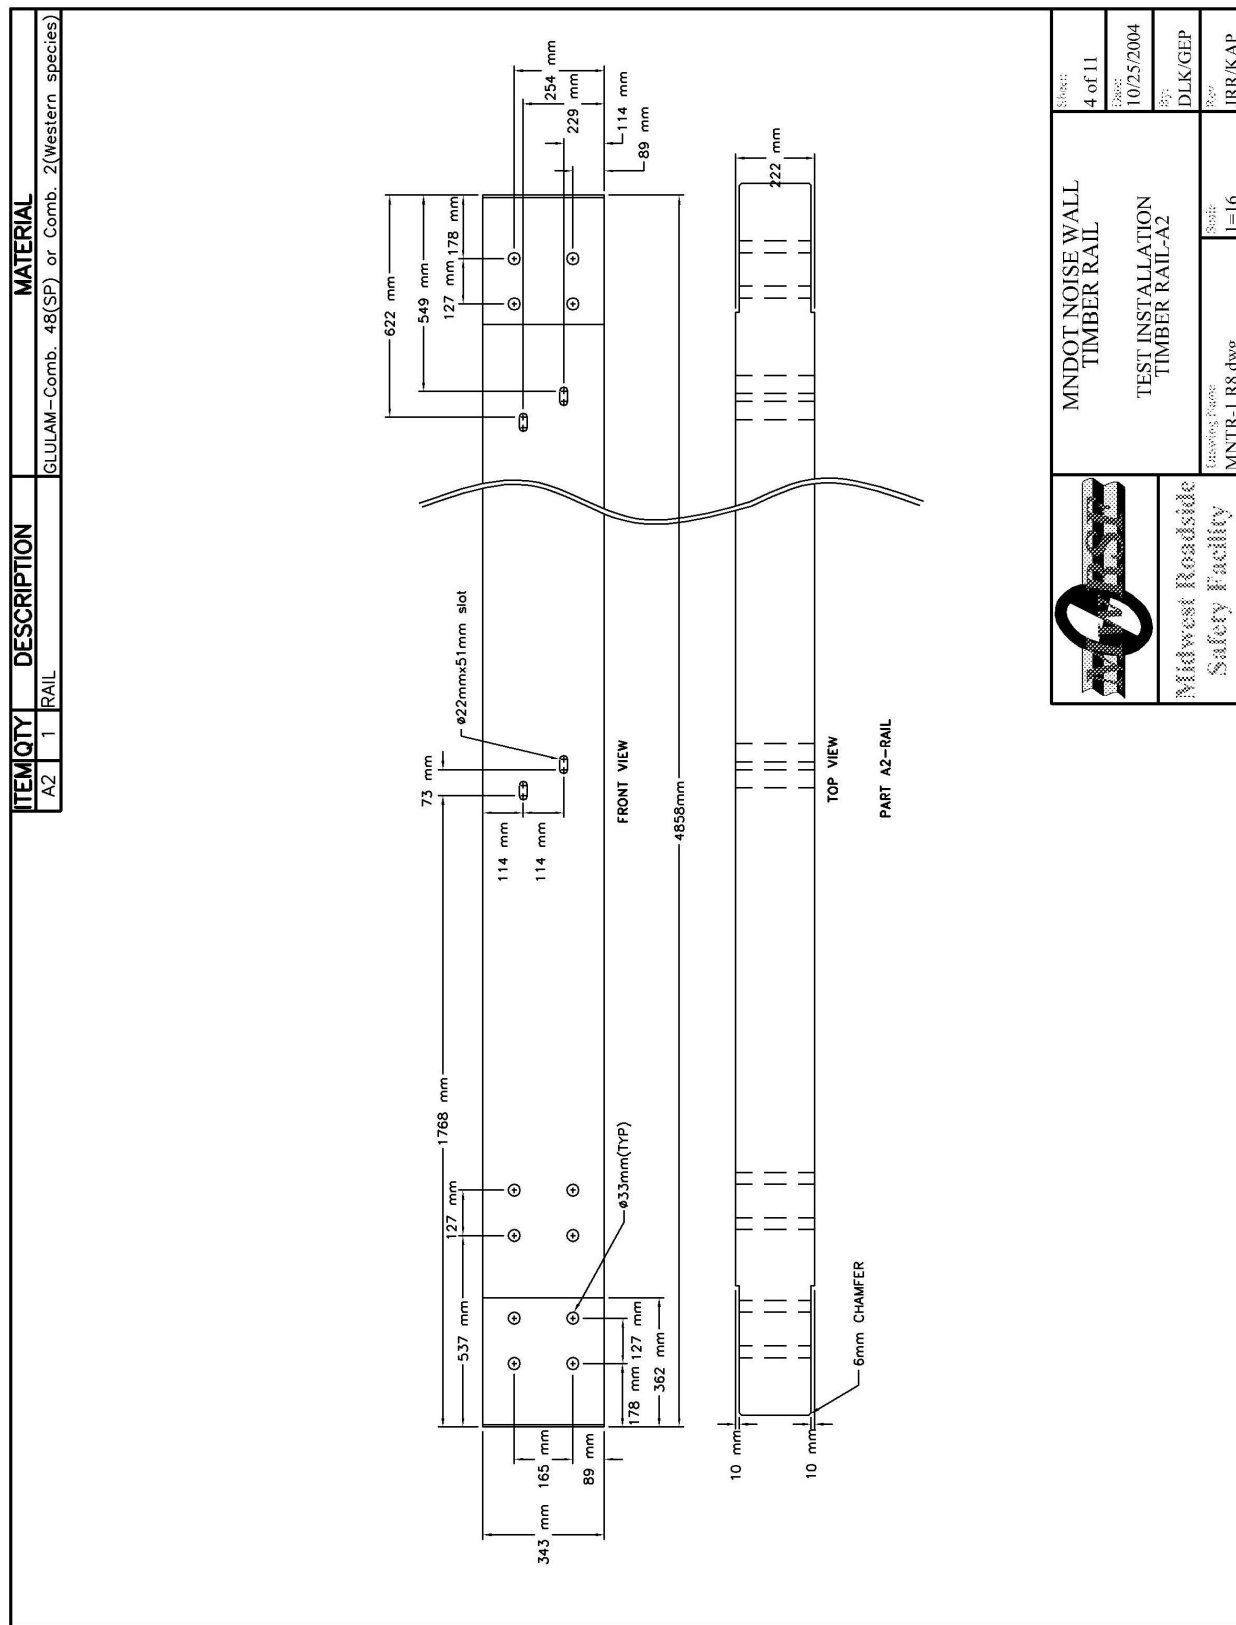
Mn/DOT's Timber Rub Rail Design Rail Details
